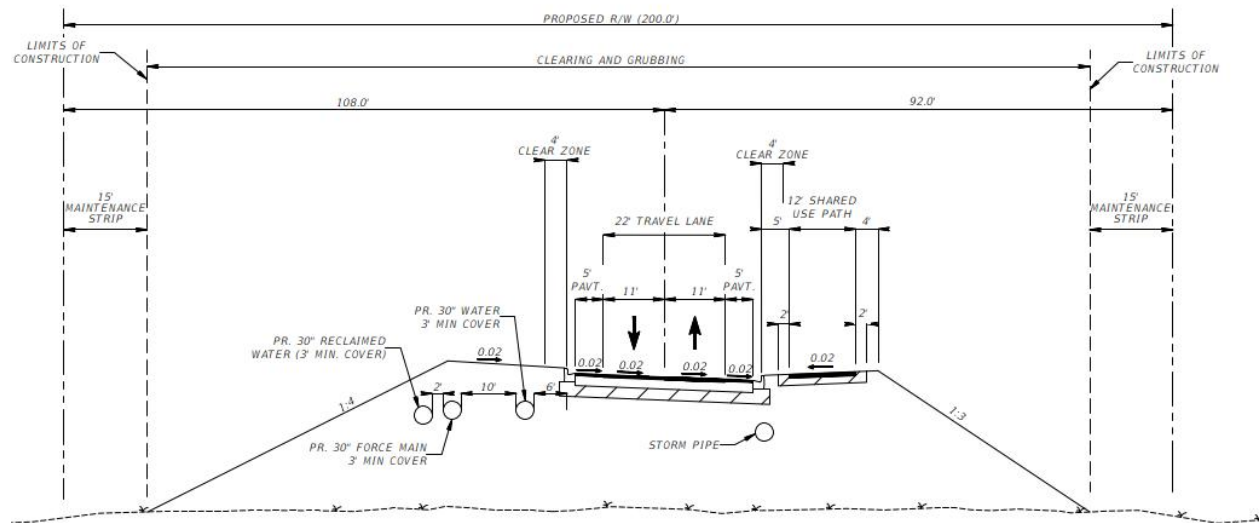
Build Alternative Typical Section, Alf Coleman Road to Chip Seal Parkway
